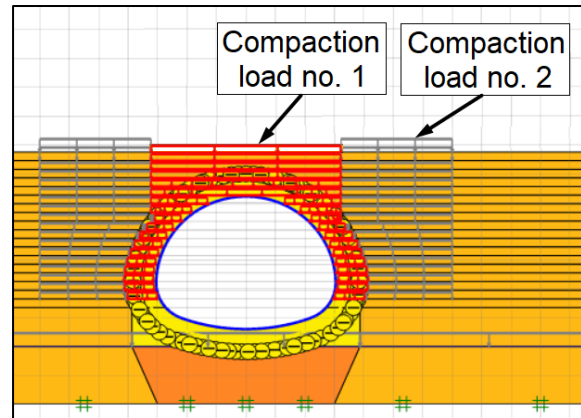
Illustration of a typical load configuration for a flexible steel-soil composite bridge. The compaction procedure is divided into «light» and «medium» compaction force which is used for backfilling and also overfilling
